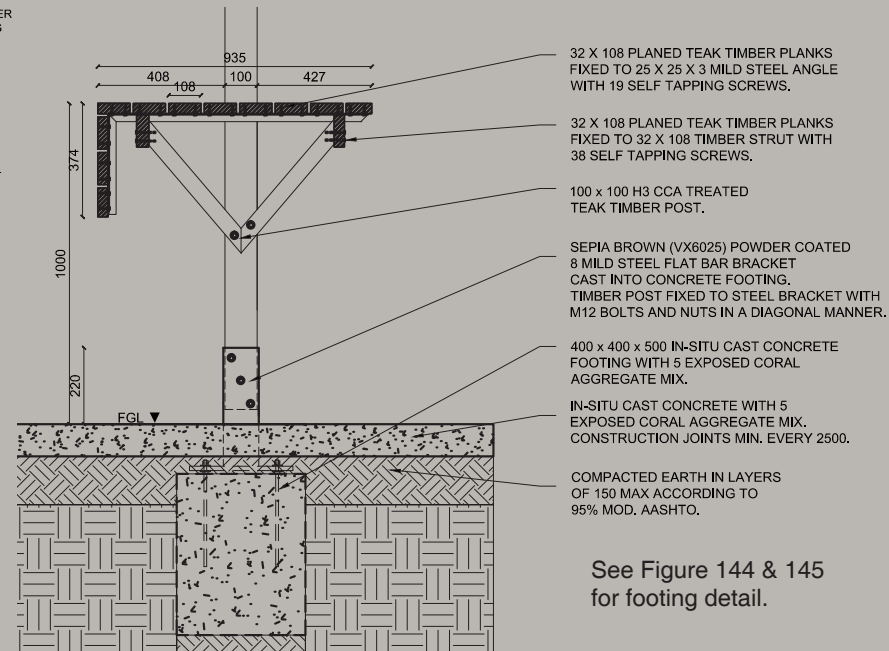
Detail Section (1:15) of Market Stand Tabletop (Author, 2014).
